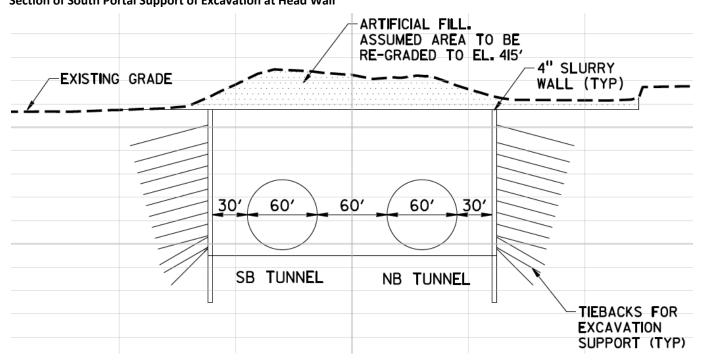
Section of South Portal Support of Excavation at Head Wall
